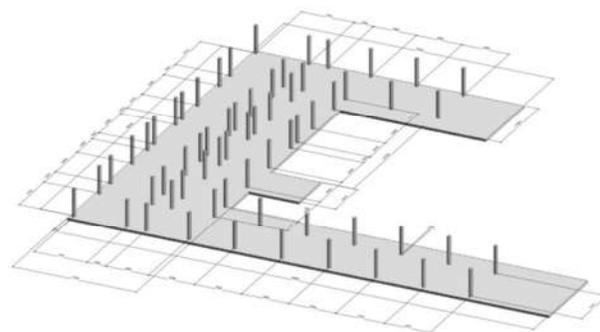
3D view of the Structural Model is composed of 63 cylindrical concrete columns and one large floor slab.
